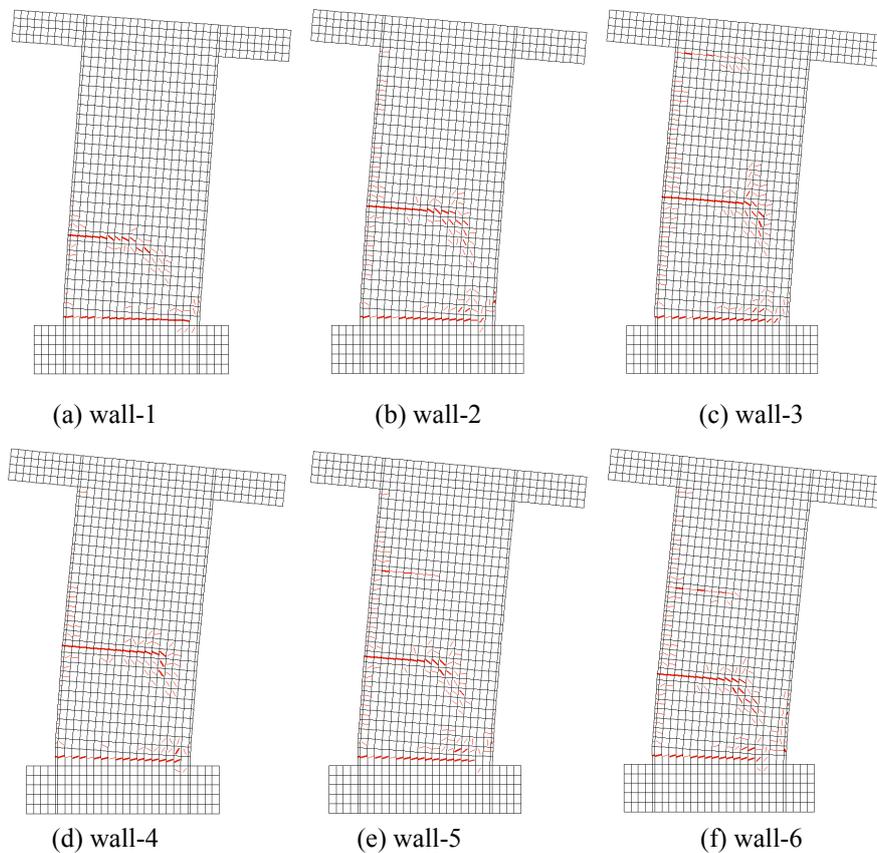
Deformed shape (magnified x5) and crack patterns when the first reinforcing bar fractured for each of the test walls modelled
